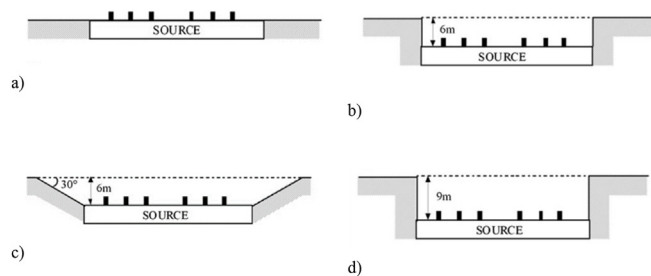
Elevation view showing cross sections through the different roadway designs studied; a) flat terrain roadway (FLAT), b) 6 m deep depressed roadway with vertical sidewalls (D690), c) 6 m deep depressed roadway with 30° sloping sidewalls (D630), and d) 9 m deep depressed roadway with vertical sidewalls (D990). The small black rectangles indicate the location of the tracer emission lines. The width of the road in all cases is 36 m. Adapted from Heist et al. (2009).
